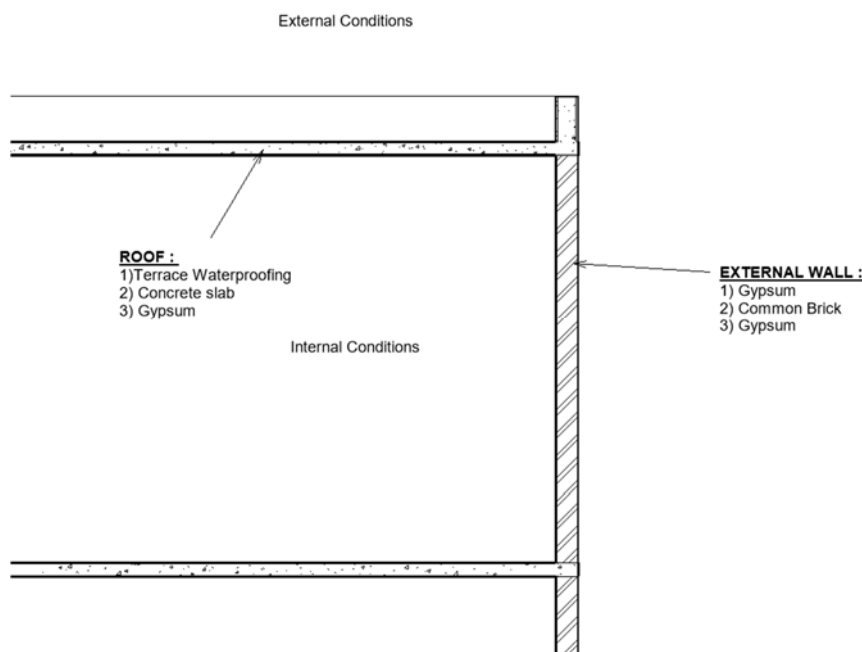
Building Envelope picture provided by (Passive House Brooklyn, n.d.)
